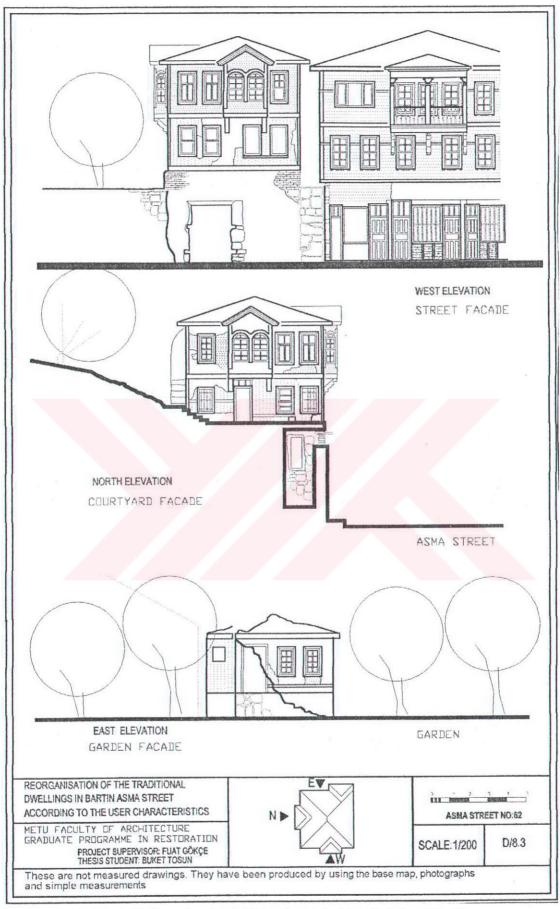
Sketch Drawings of Facades of the Building No:62
